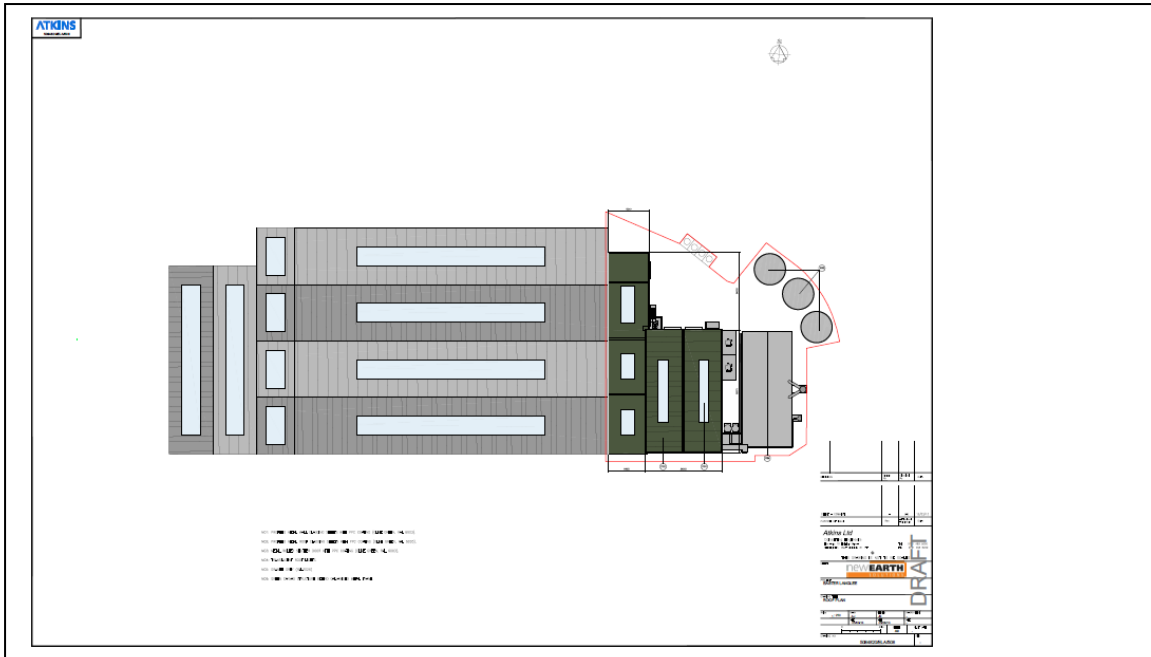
; Changes to o/a plant layout Fig 4& 5; Changes to elevations
